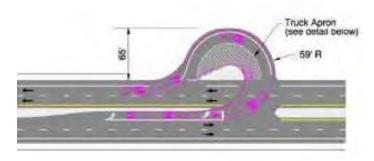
Example of Potential Opportunities to Facilitate U-turns by Widening Intersections
